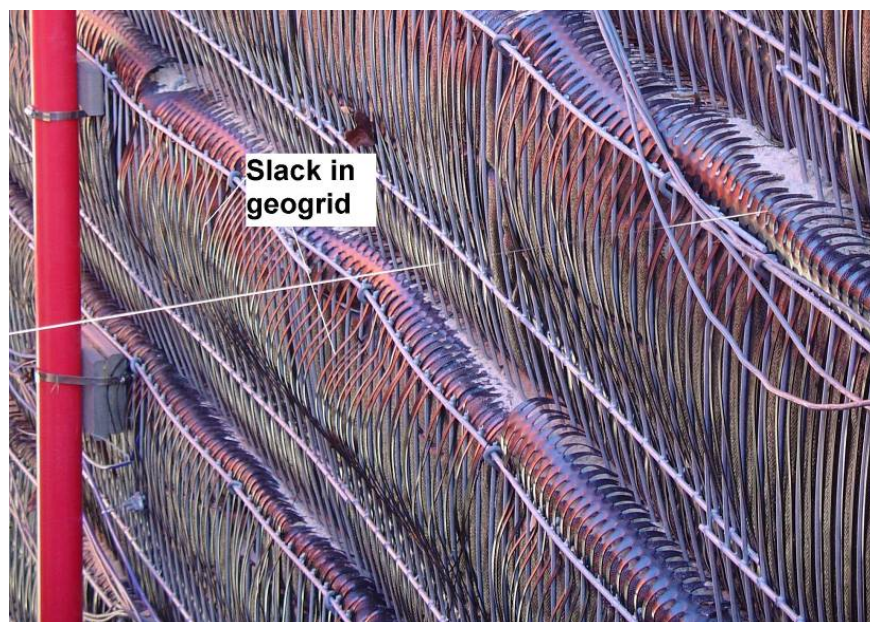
Photo. Development of slack in geogrid reinforcement during wall loading.
